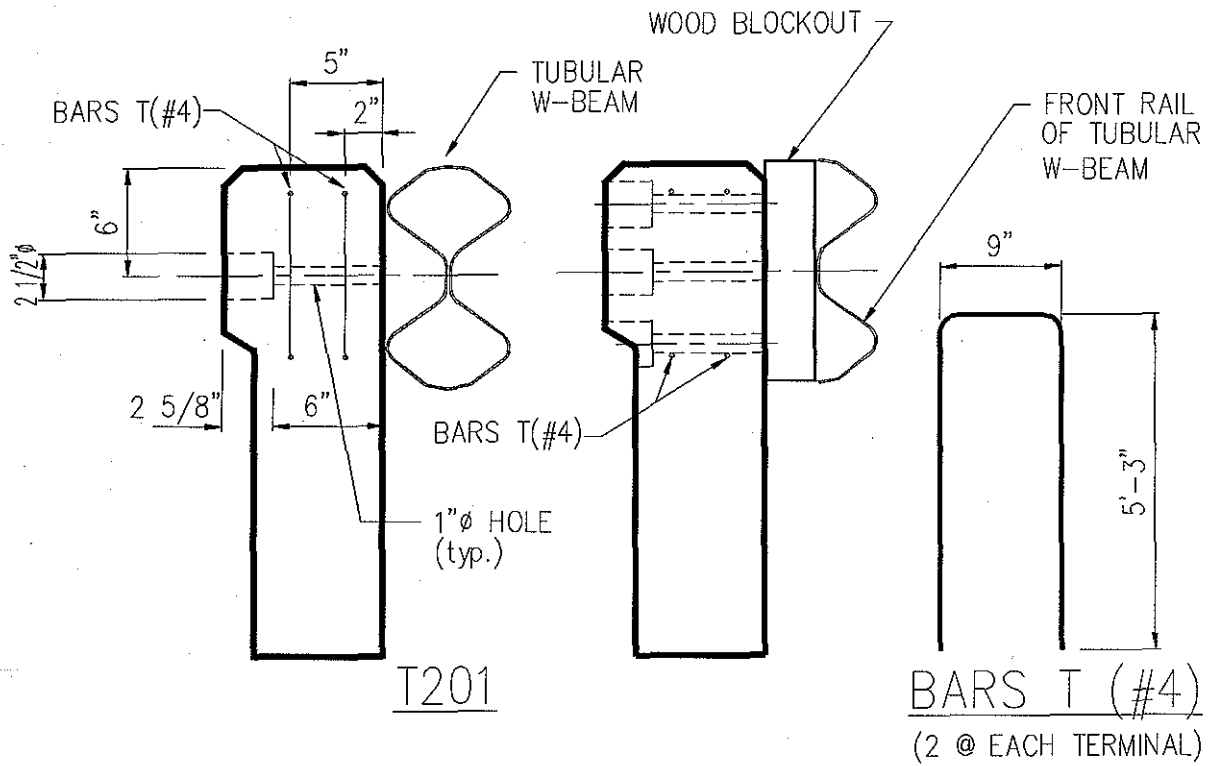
TERMINAL CONNECTION DETAILS FOR RETROFIT INSTALLATION
